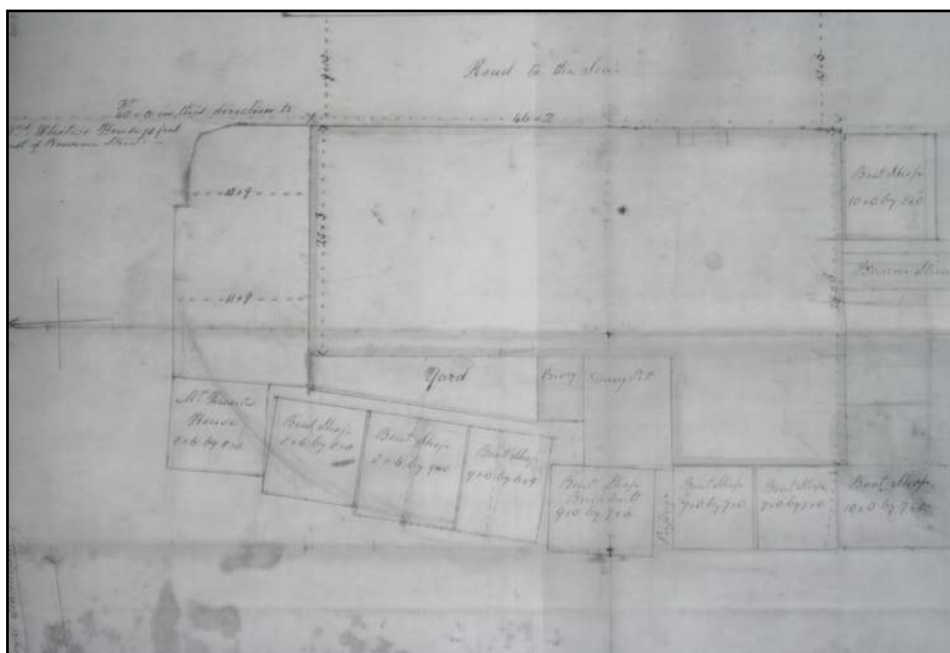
The Stade: 1846 plan of houses and shops at Bourne's mouth
